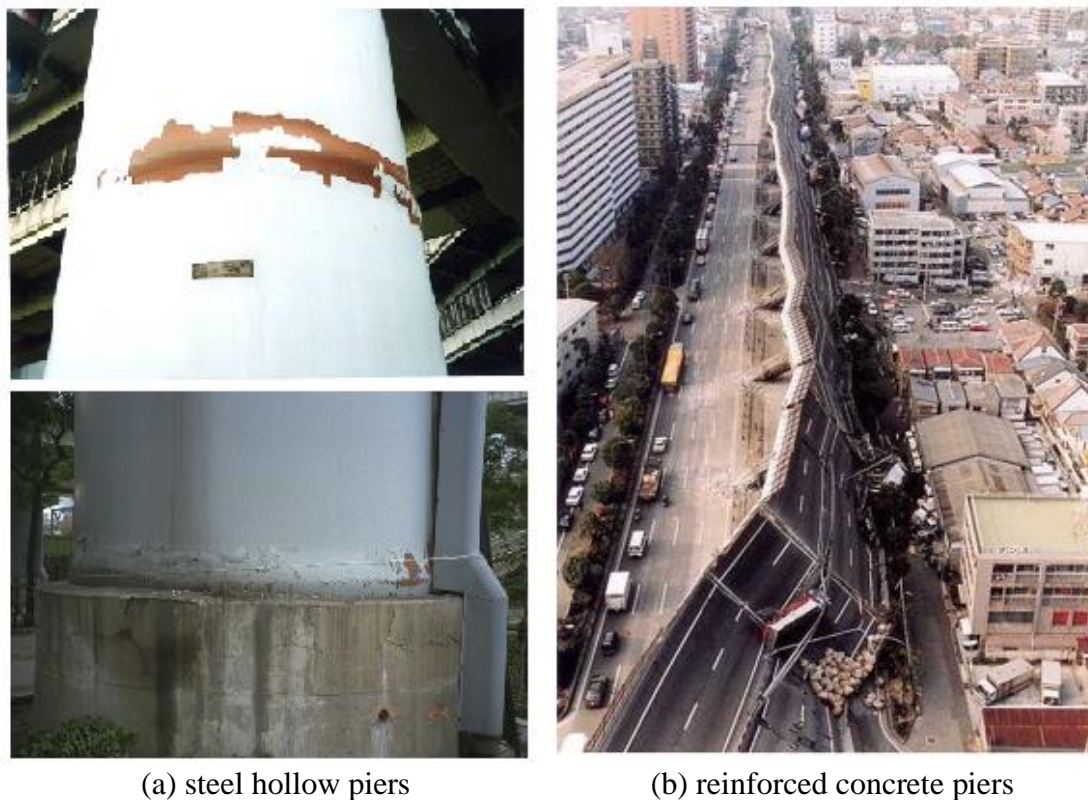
Damage of (a) steel hollow piers and (b) reinforced concrete piers under the earthquake
